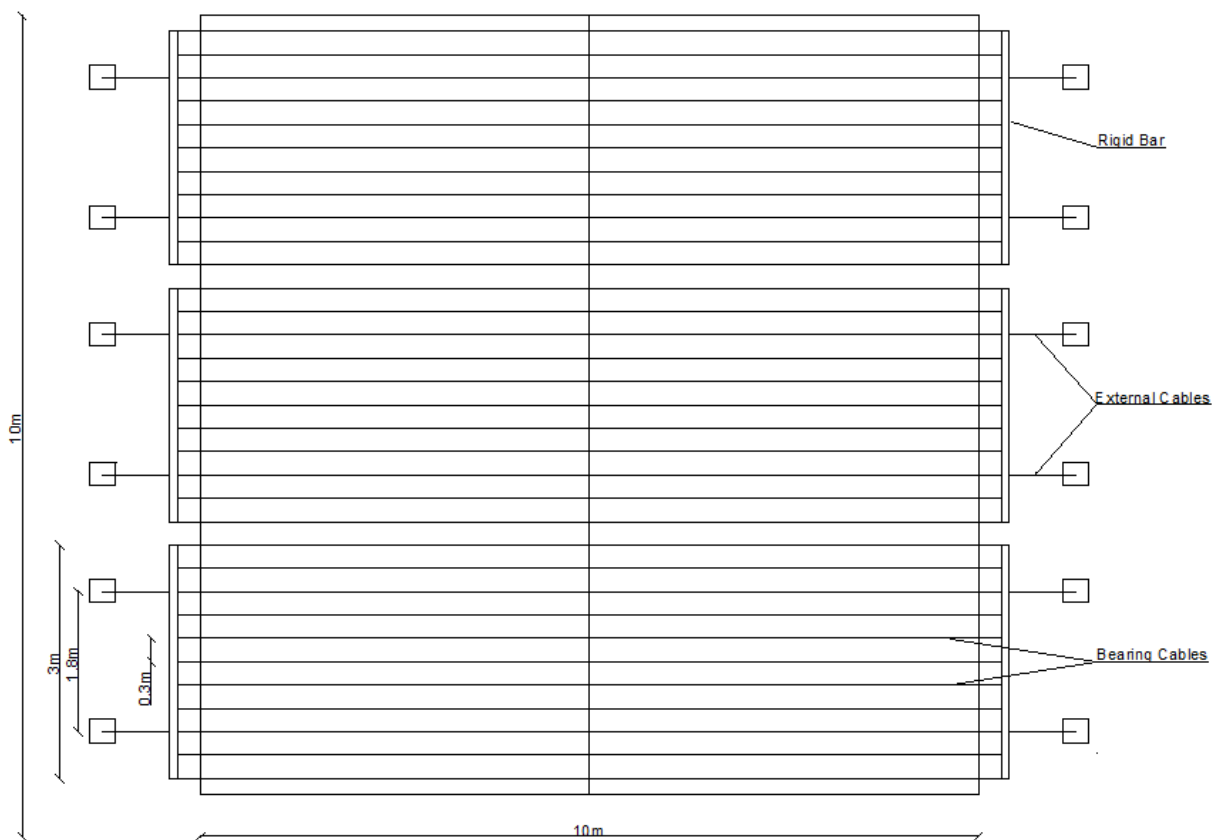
Plan view of proposed retrofit system as applied to a gable-style roof
